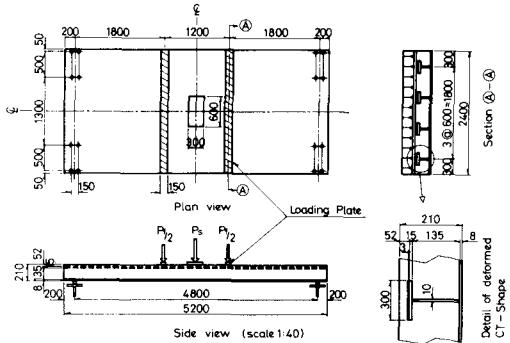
Dimensions and loading arrangement of composite slab specimen A
